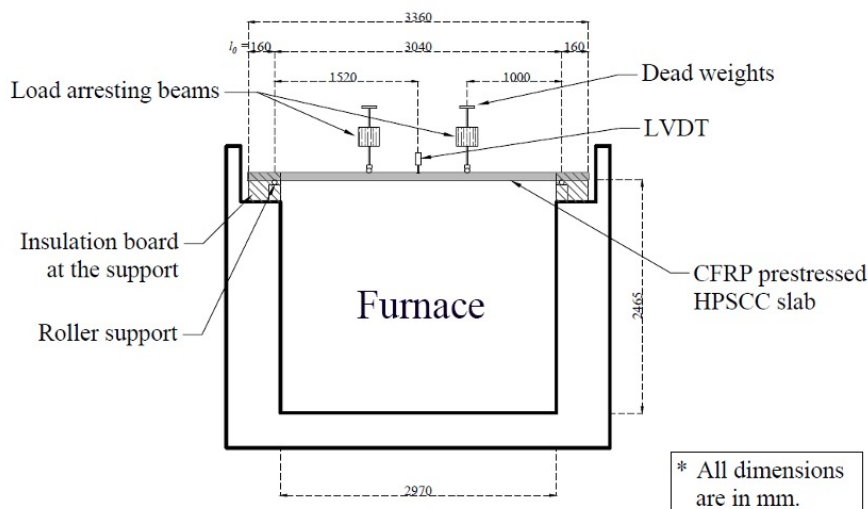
Layout and test setup for the large-scale fire resistance tests (plan and side elevation views) (after Terrasi et al. 2012).
